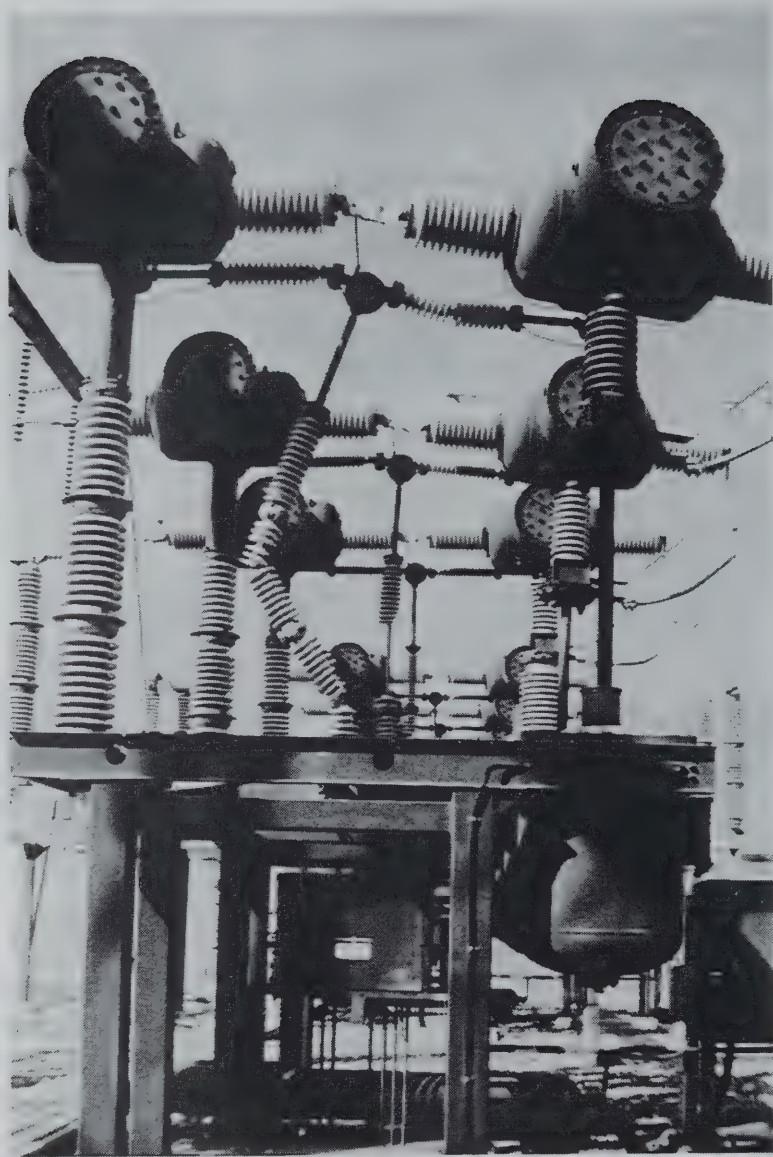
Damaged live-tank circuit breaker with damaged support columns and high-pressure gas piping system.
